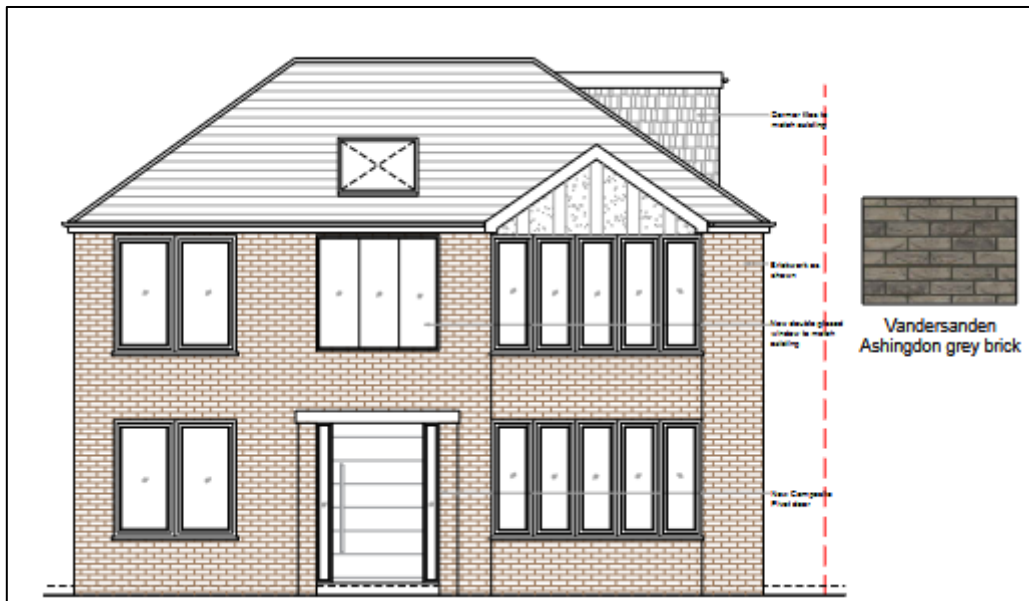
Proposed Front Elevation - DE Architectural Consult. Ltd
